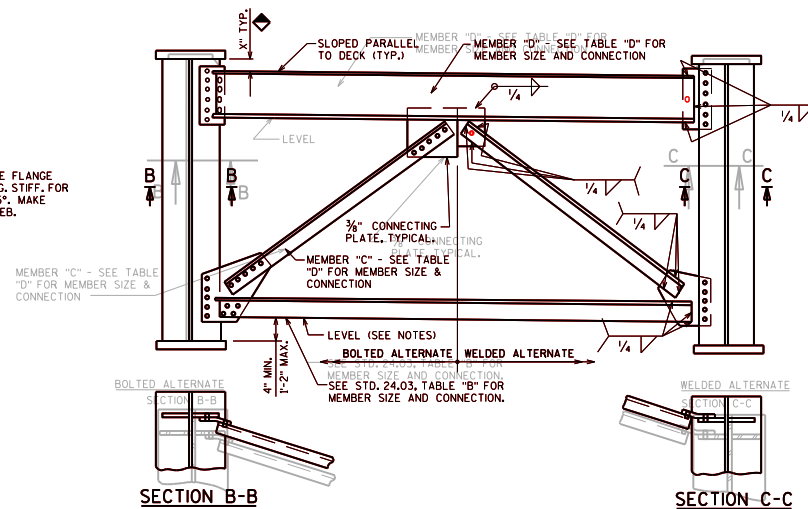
PLATE GIRDER DIAPHRAGMS AND CROSS FRAMES
